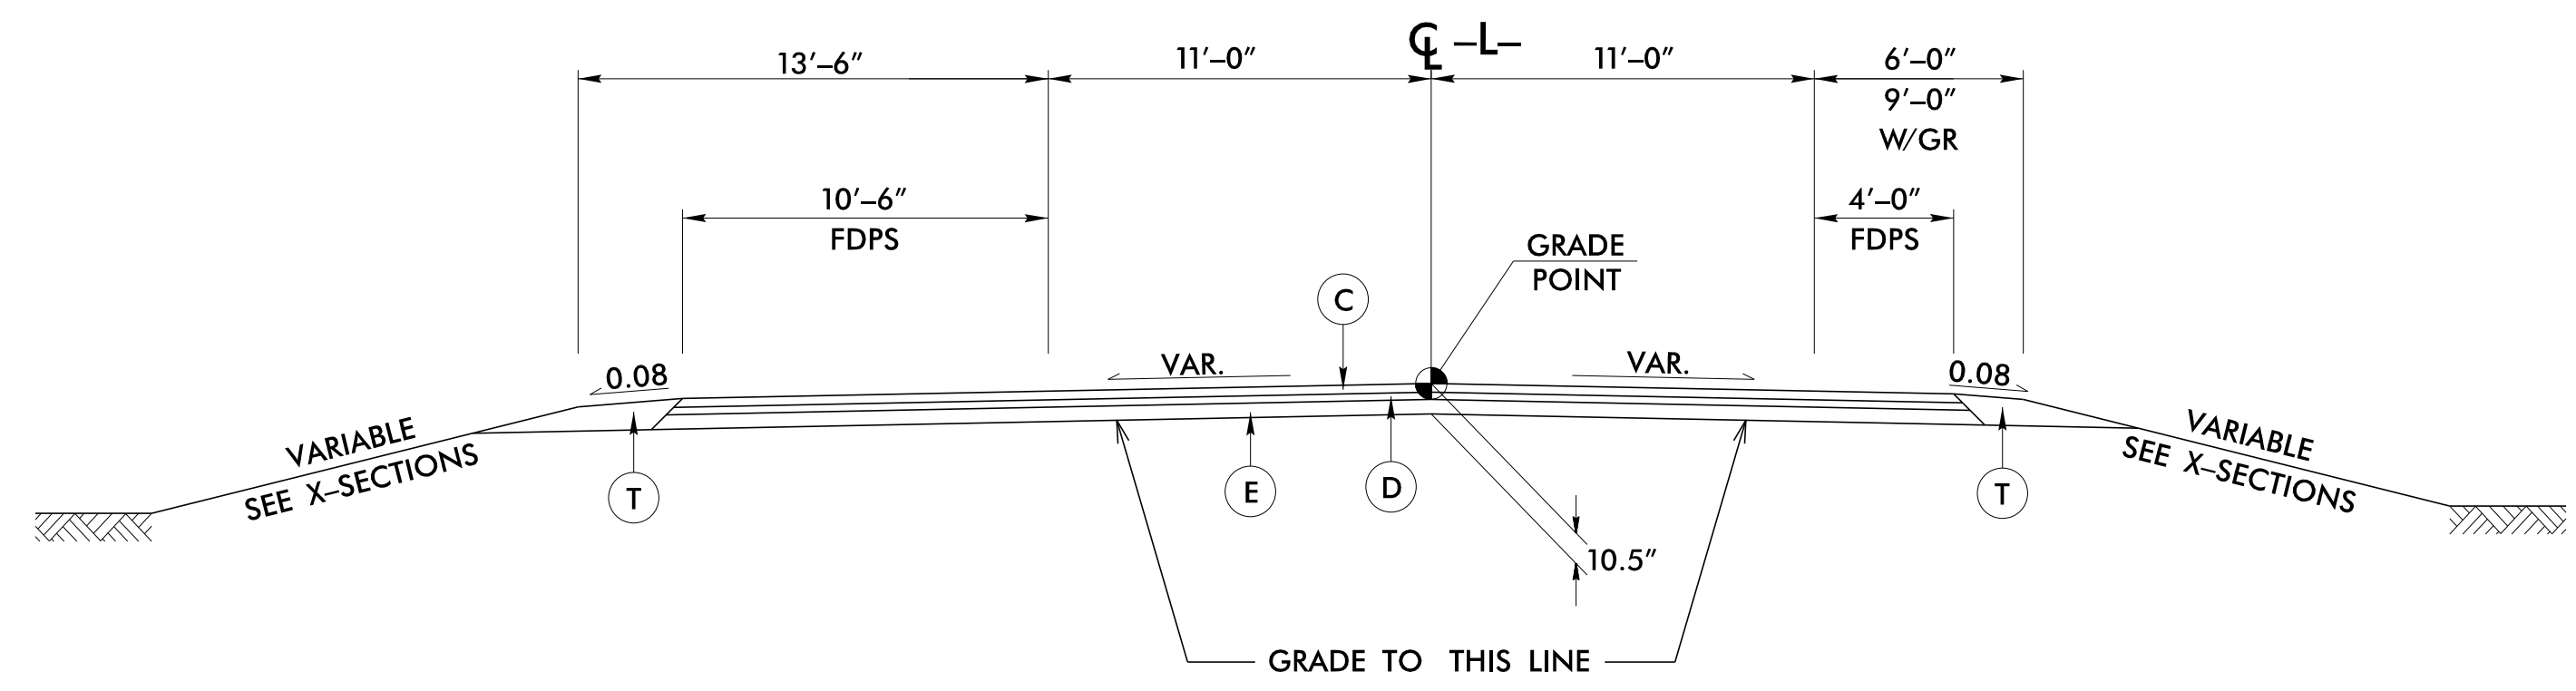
DETAIL FOR FULL DEPTH PAVED SHOULDER IN CONJUNCTION WITH GUARDRAIL
